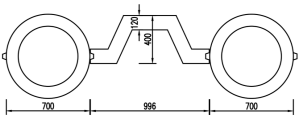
Plan and cross section of the semi-continuous pipe-sheet pile wall, SW400+D700x110.
